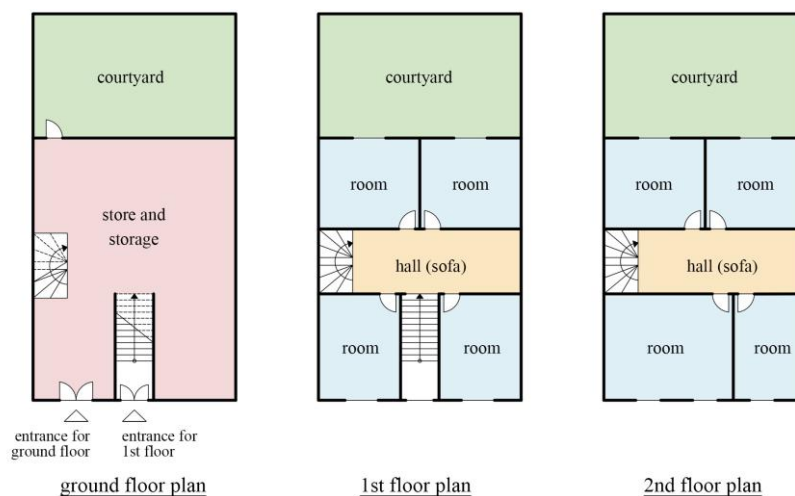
A schematic floor plan example of Ayvalık traditional houses
